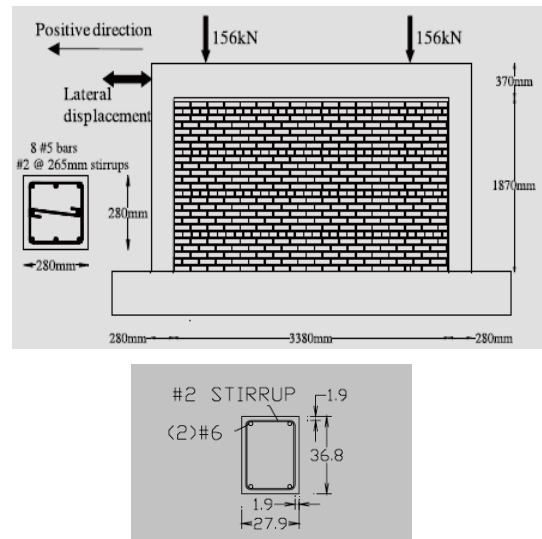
Masonry infilled R/C frame CU1 specimen and design details [9].
